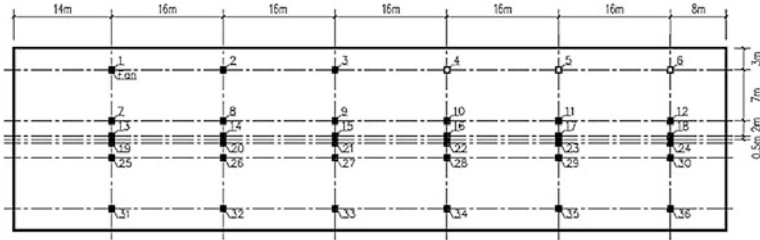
Layout of the exhaust port on the ceiling of the generator floor
